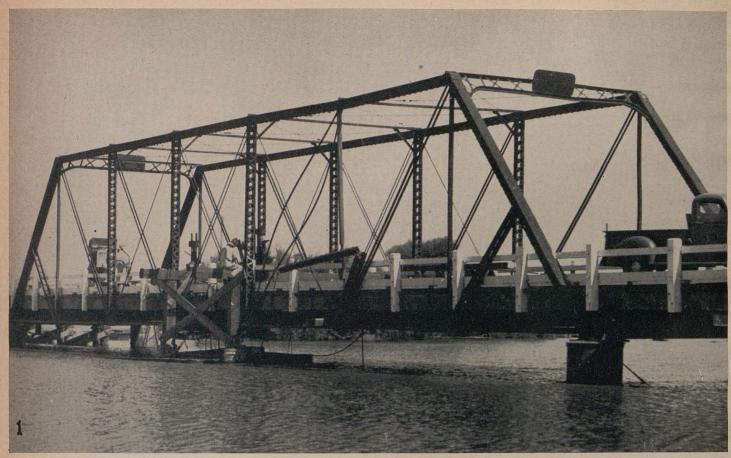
PLATE METHOD OF STRENGTHENING FLOOR BEAMS
